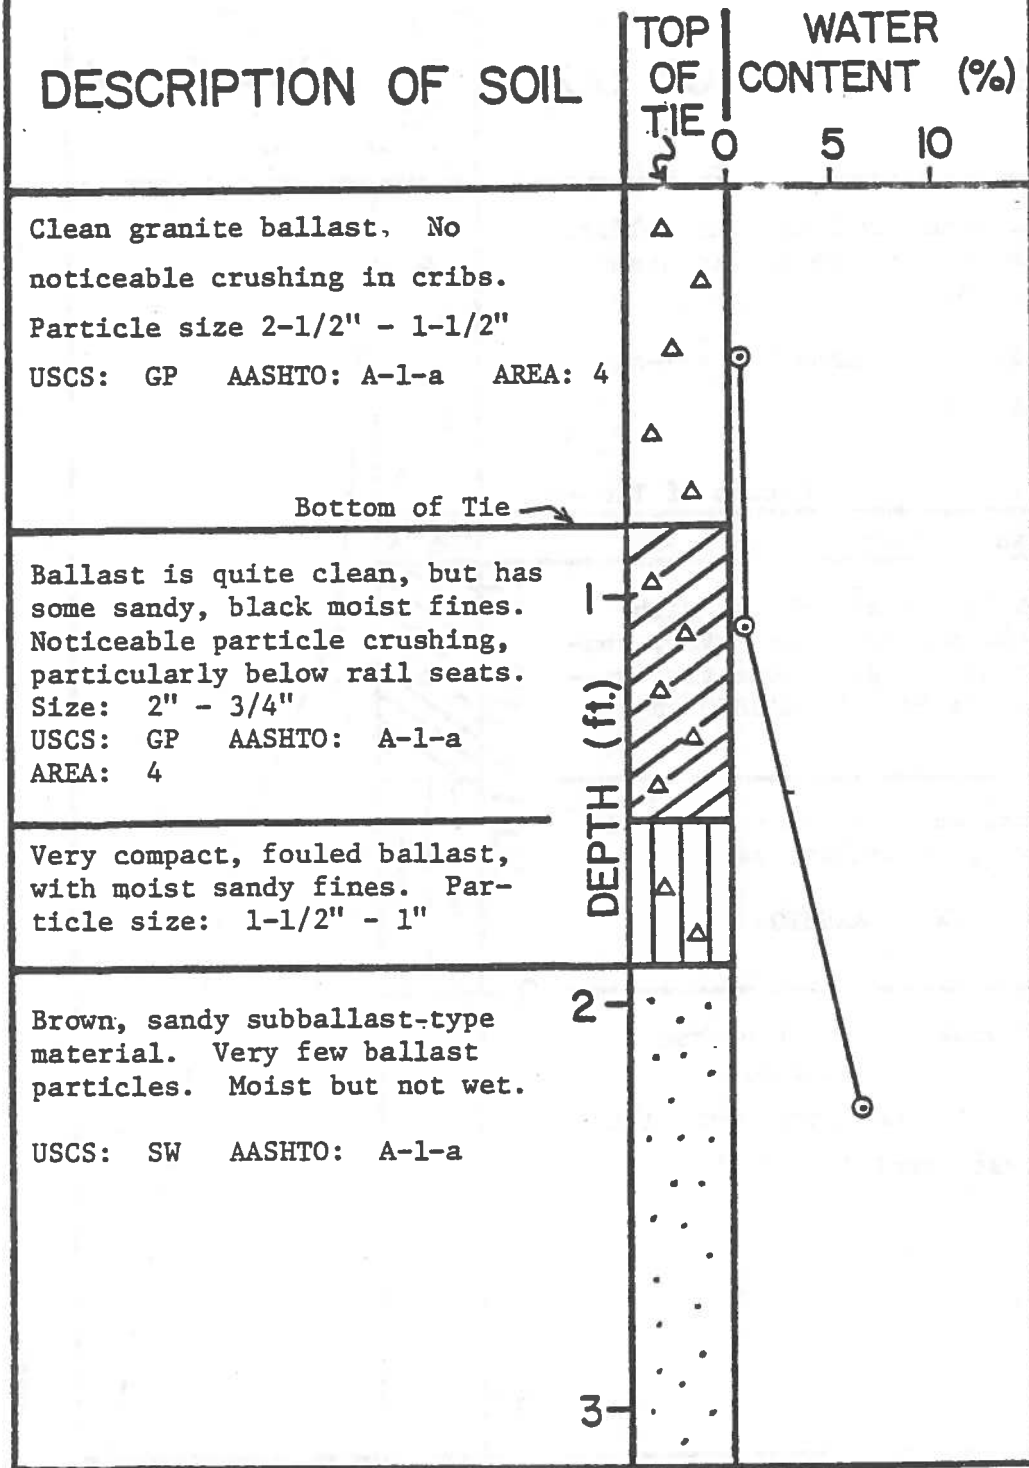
BALLAST PROFILE FOR STREATOR CONCRETE TIE SECTION
